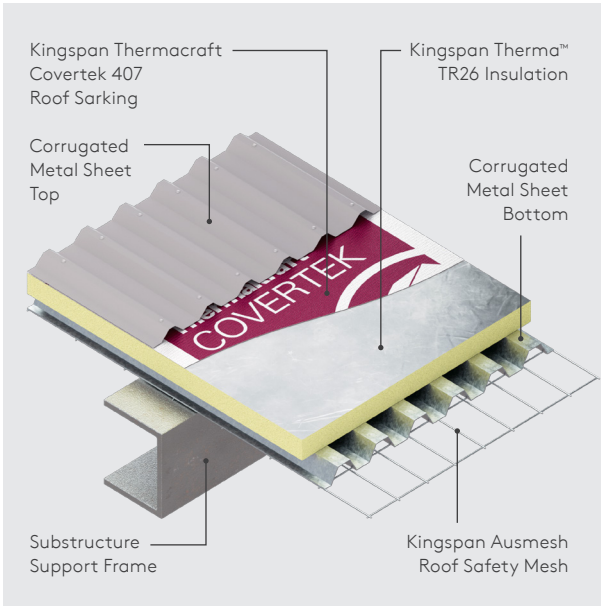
Kingspan Therma™ TR26 in a Built-up Metal Deck Roof.
